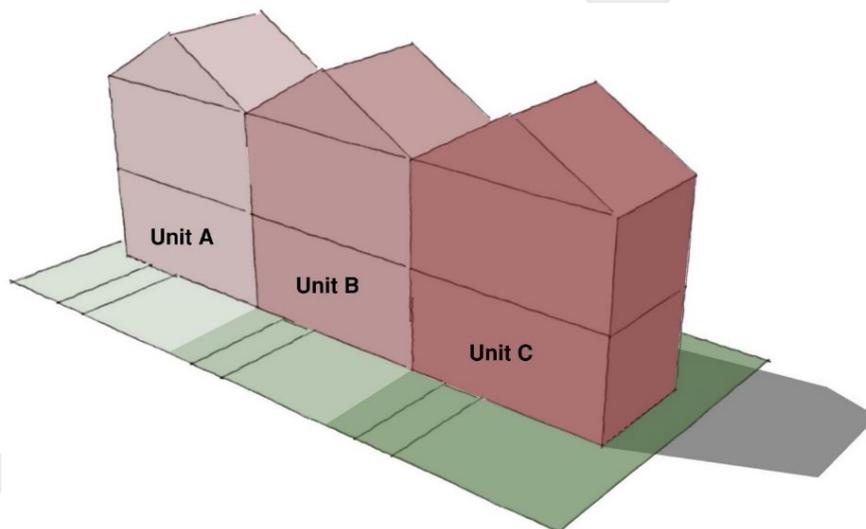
Illustration of Attached Dwelling, 3-Unit Rowhouse / Townhouse on Separate Lots
